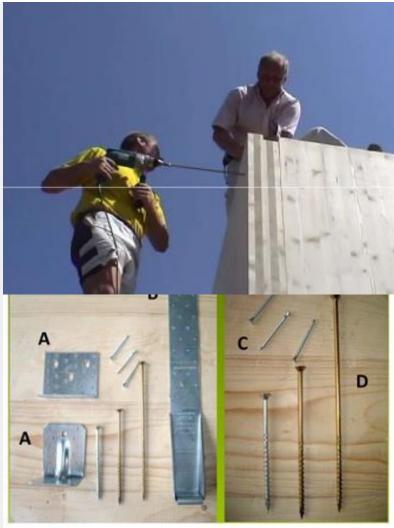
Examples of metal fasteners, ties and connectors
